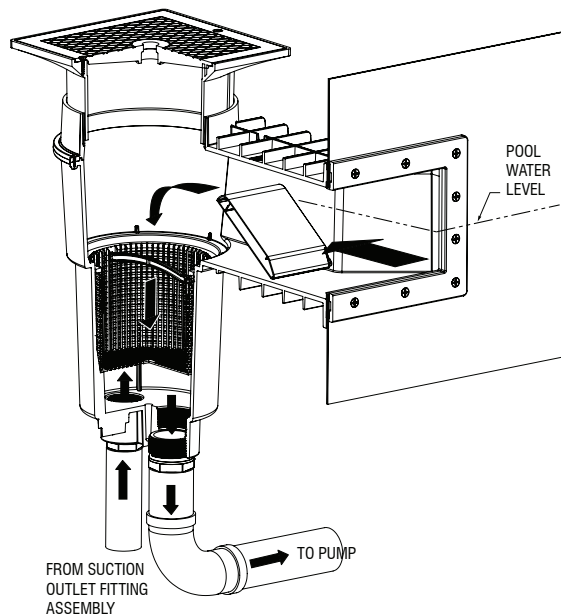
Skimmer installed with line for the Suction Outlet Fitting Assembly (SOFA) integrated in the skimmer assembly.
